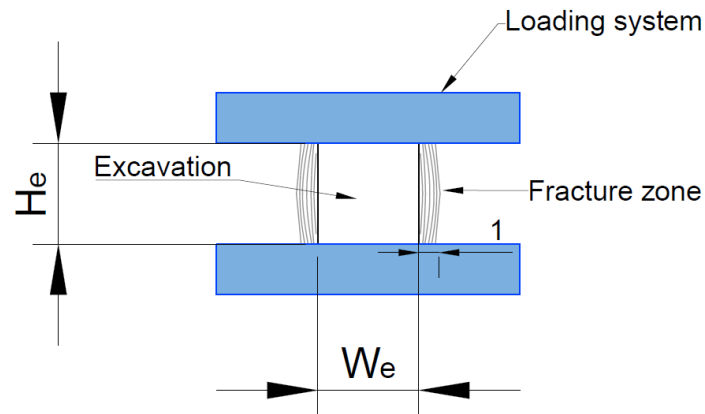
Fractured zone of rock mass with an extent of 1 m in the sidewall of an excavation and the corresponding loading system.
